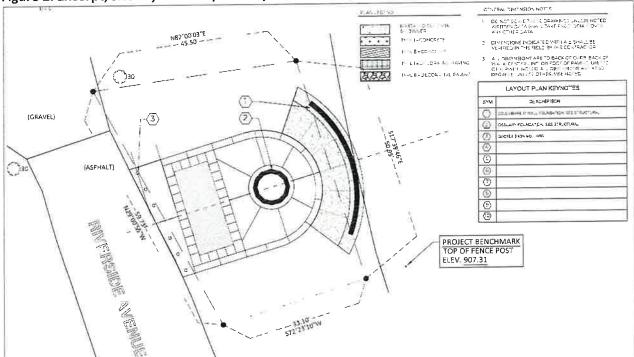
Excerpt, Site Layout - Proposed by AGL Landscape Architects, P.C.
